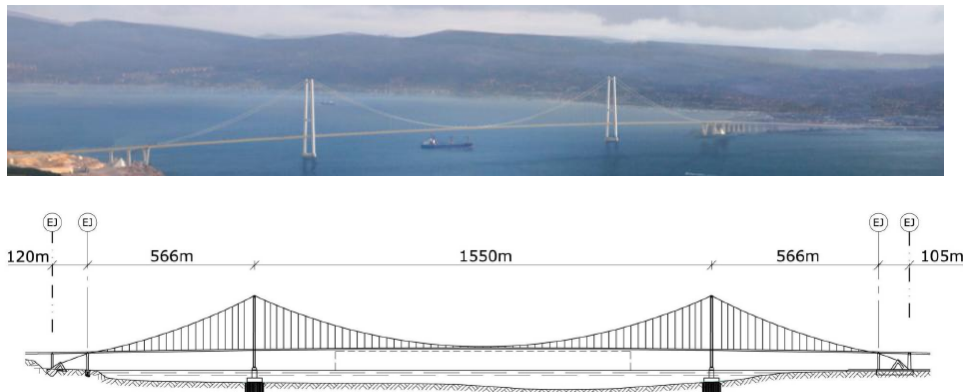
General layout of Izmit Bay Bridge (North to south = left to right)
